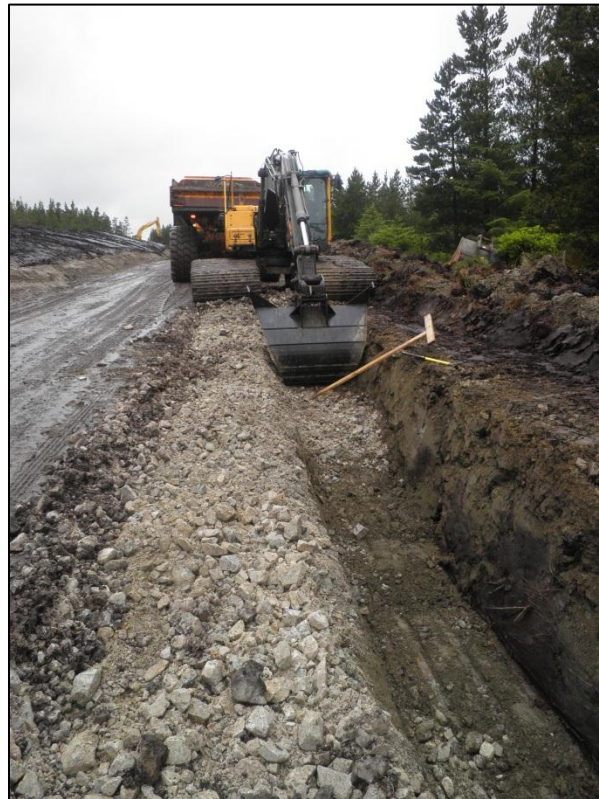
Pipeline wayleave: western V-ditch, facing south.
